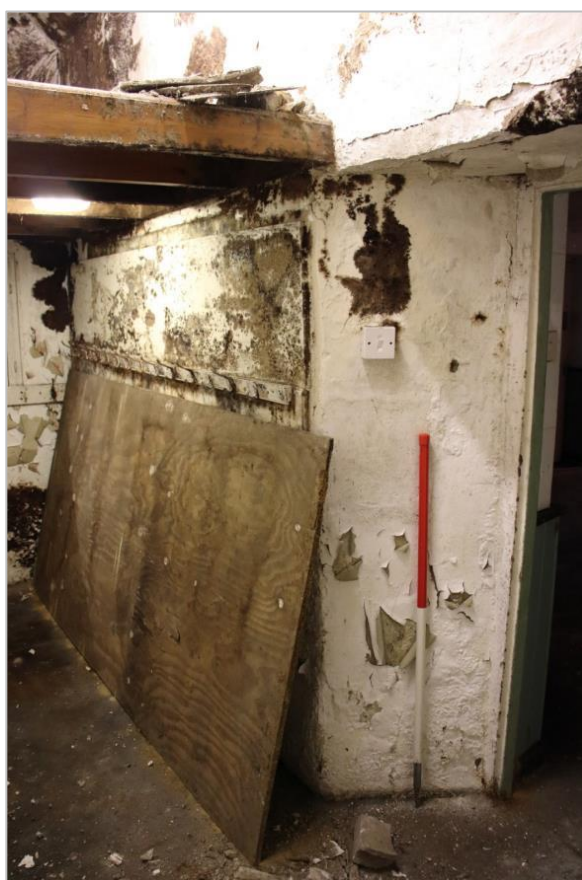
North and east wall of Kitchen 1; door leads to Dining Room.
